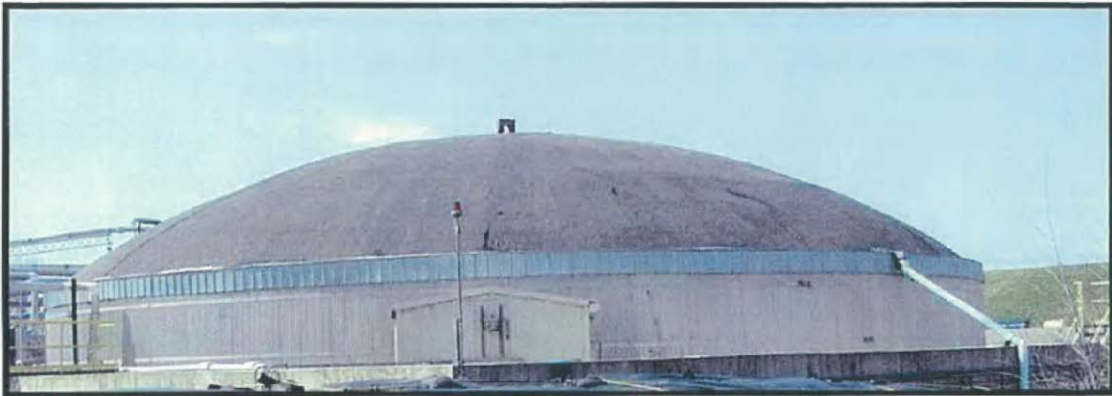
WASTEWATER STORAGE TANK (S02)
